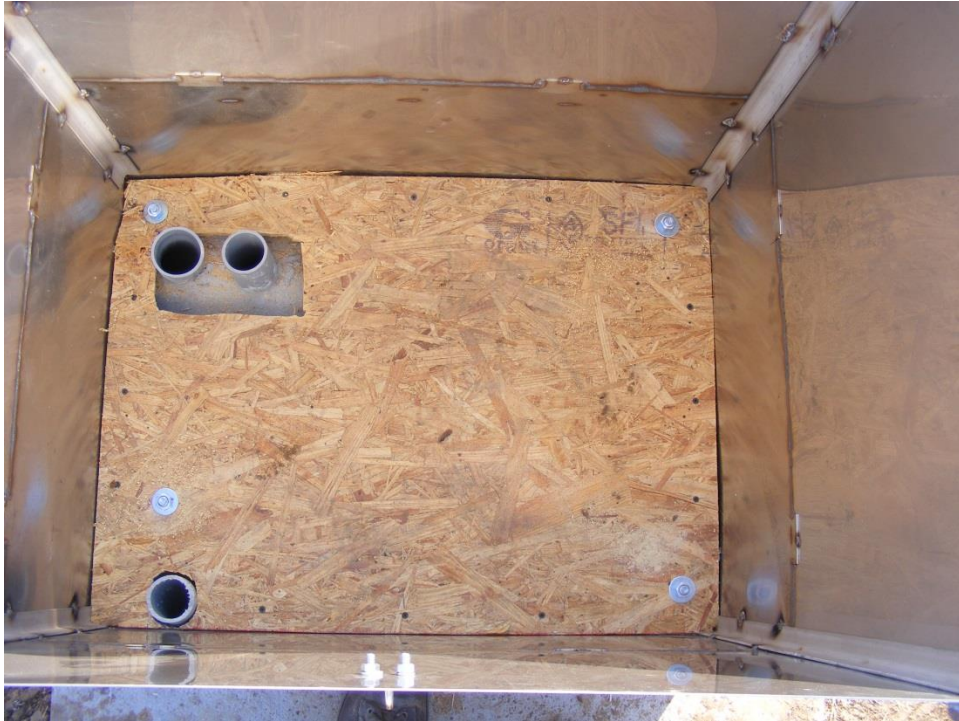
Inside of stainless steel monitoring station box with conduit pipes
